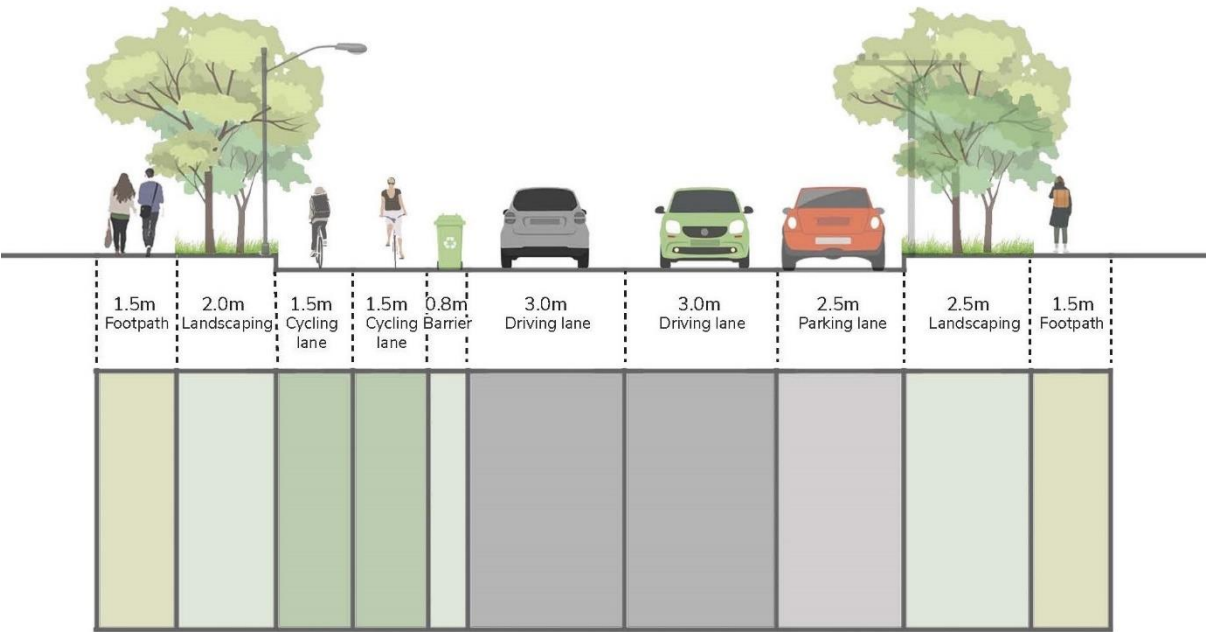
Cross-section proposed design Derby Street-Sussex Street O’Hea Street, Coburg
